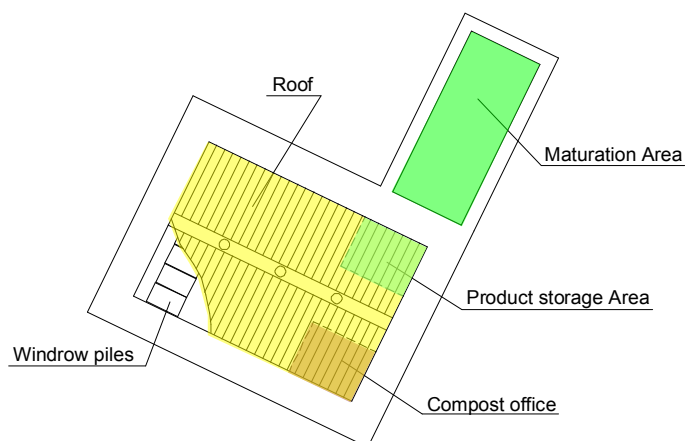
Layout of Proposed Compost Plant in Dang Kor Disposal Site
